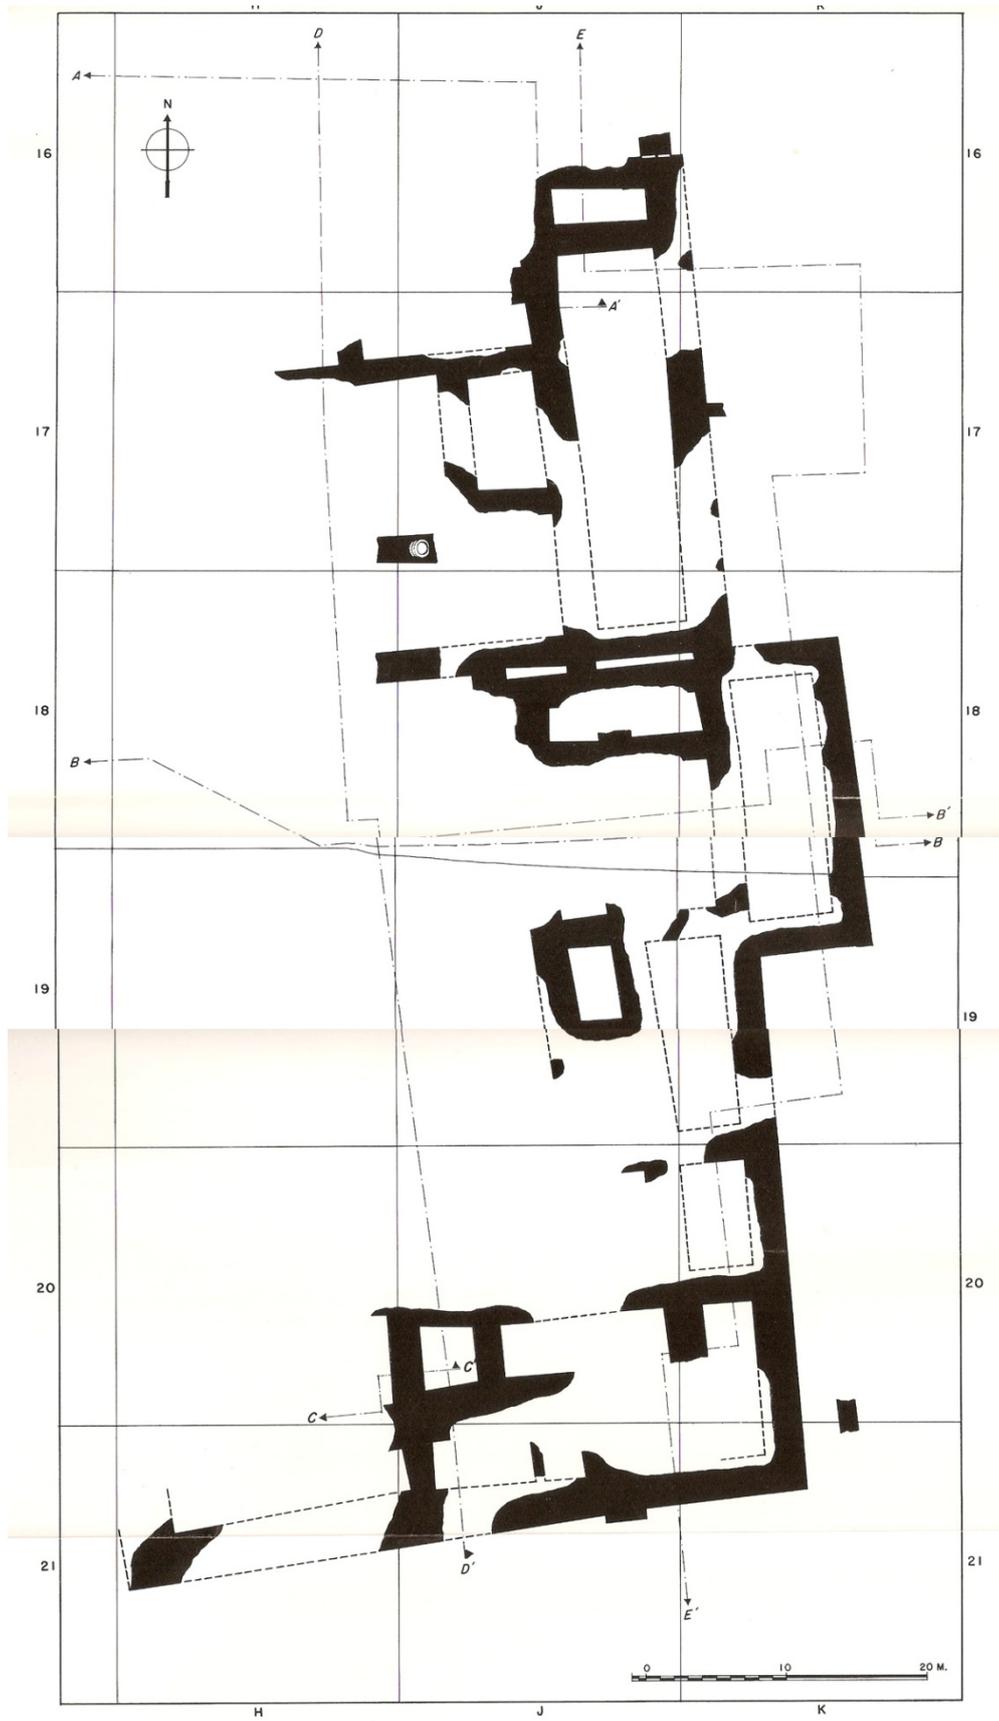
Plan of Building XIV at Tell Ta'yinat (First Building Period)
